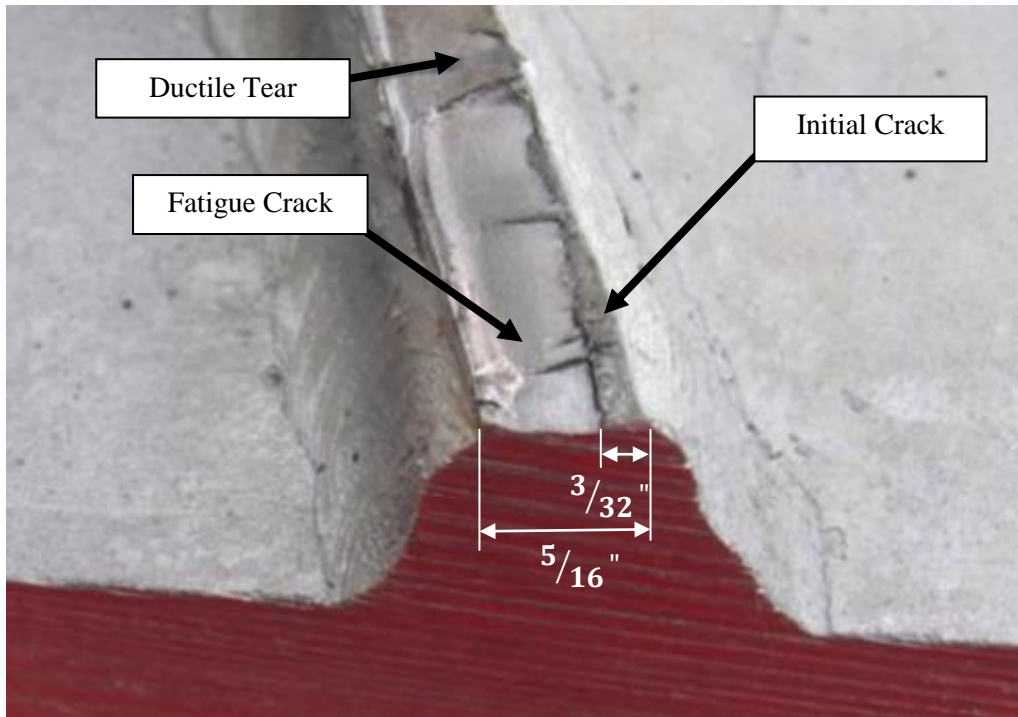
Depth of initial crack at weld toe of bend 5 from 33-3-12-TX-SG-A (Pool, 2010)
